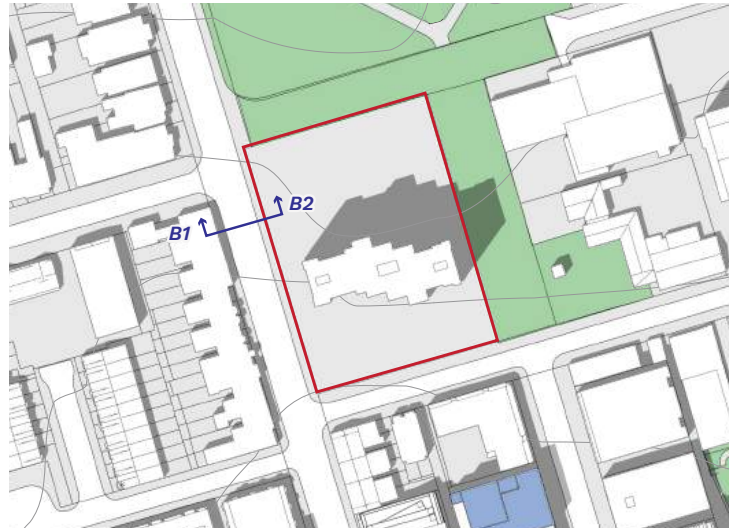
Existing Street Section To Remain - Stephanie Street (Looking East)
